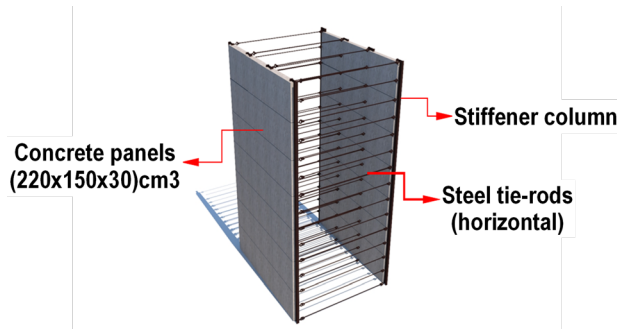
Parallel concrete panel with horizontal tie rod configuration (Type B)
